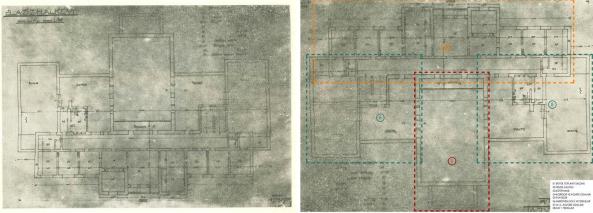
First floor plan of Elazığ People's House [18] Figure 15. Units on the first floor of Elazığ People's House [18]
